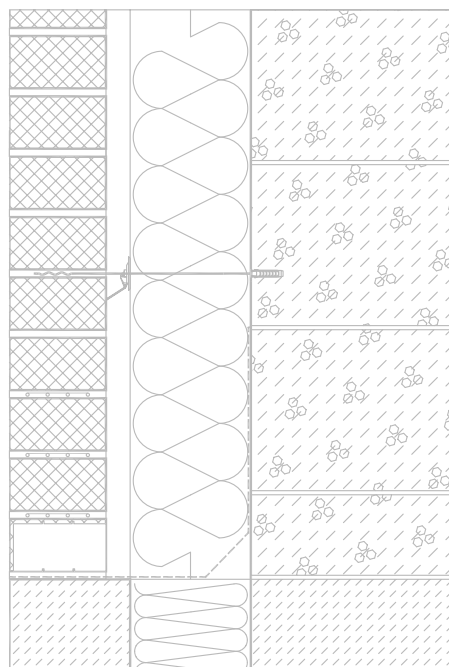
Supporting the facade over the entire surface of the brick thickness 6-8 m
